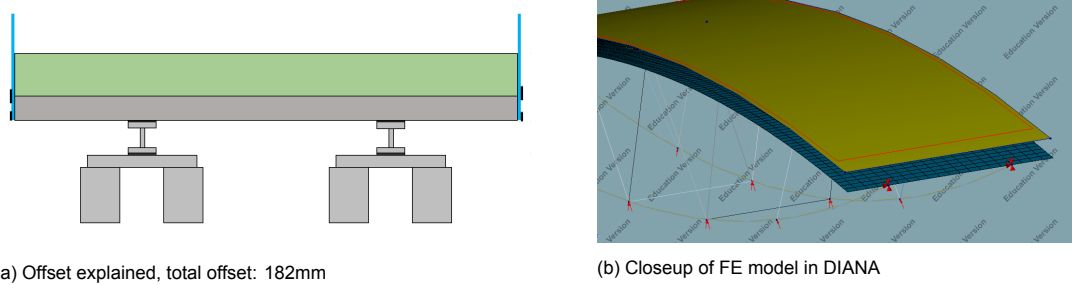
Boundary conditions of the Glass Truss Bridge, offset of the soil layer
